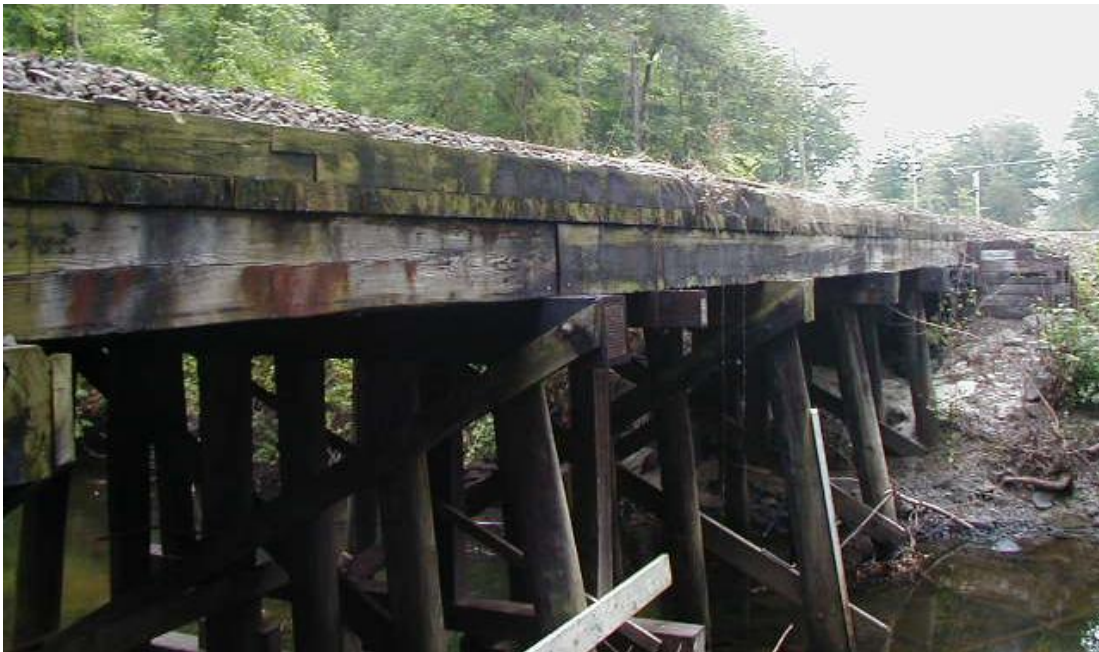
Timber multi stringer bridge with timber bent substructure.
